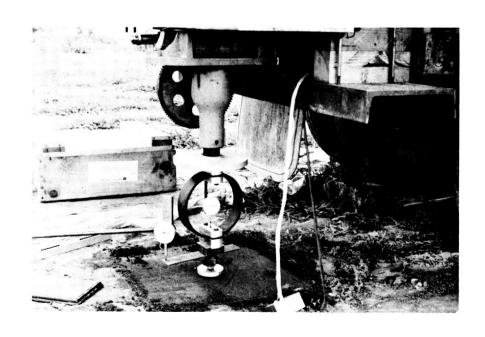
TEST SETUP SHOWING CHANNELS, MOTOR, JACK, PROVING RING, EXTENSOMETER, PLATE, AND TRUCK
